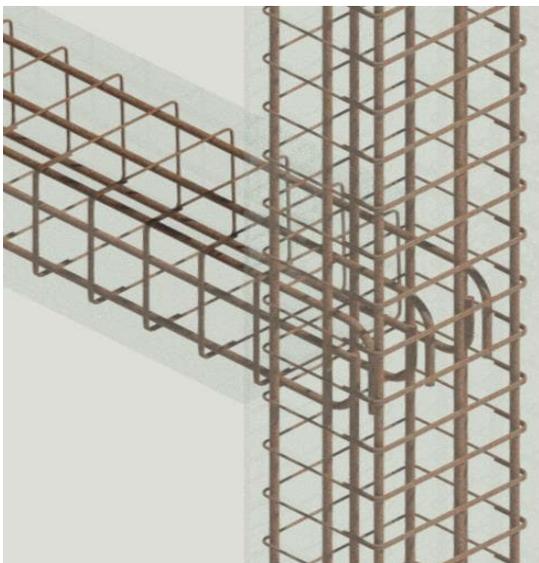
Beam to Column Joint using traditional 90° Bent Hook
